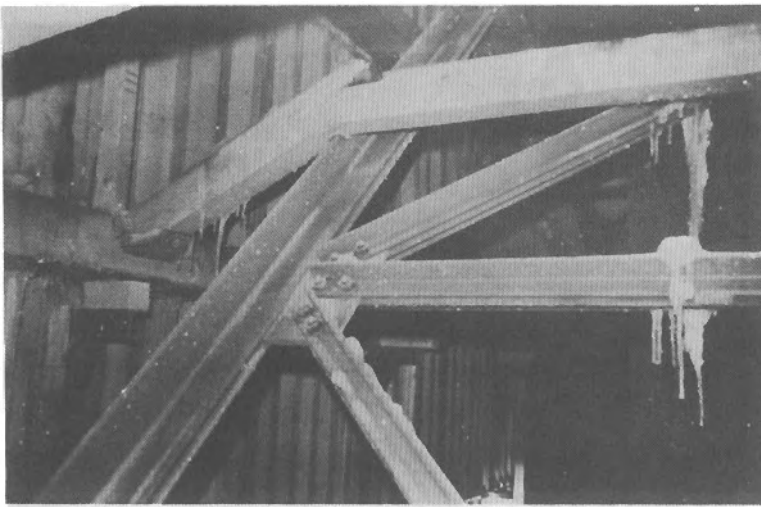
Interference between the timber truss enclosure and the subsurface trusses.
